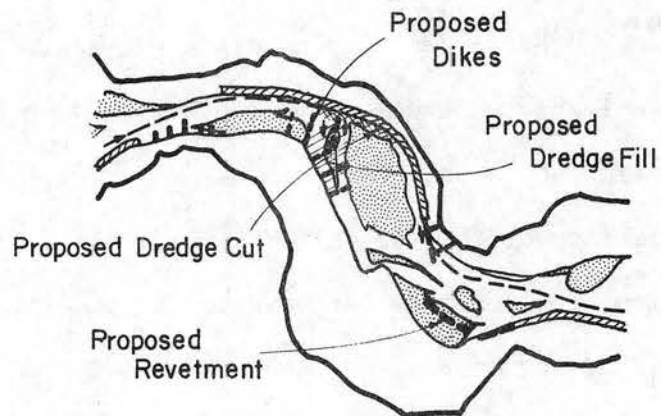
shows the proposed work which will be required for final stabilization of this reach. The heavy dashed lines indicate standard articulated concrete mattress revetment, the dashed lines indicate training structures, the double hatched area indicates required dredging, and the single hatched area indicates dredge material disposal.
